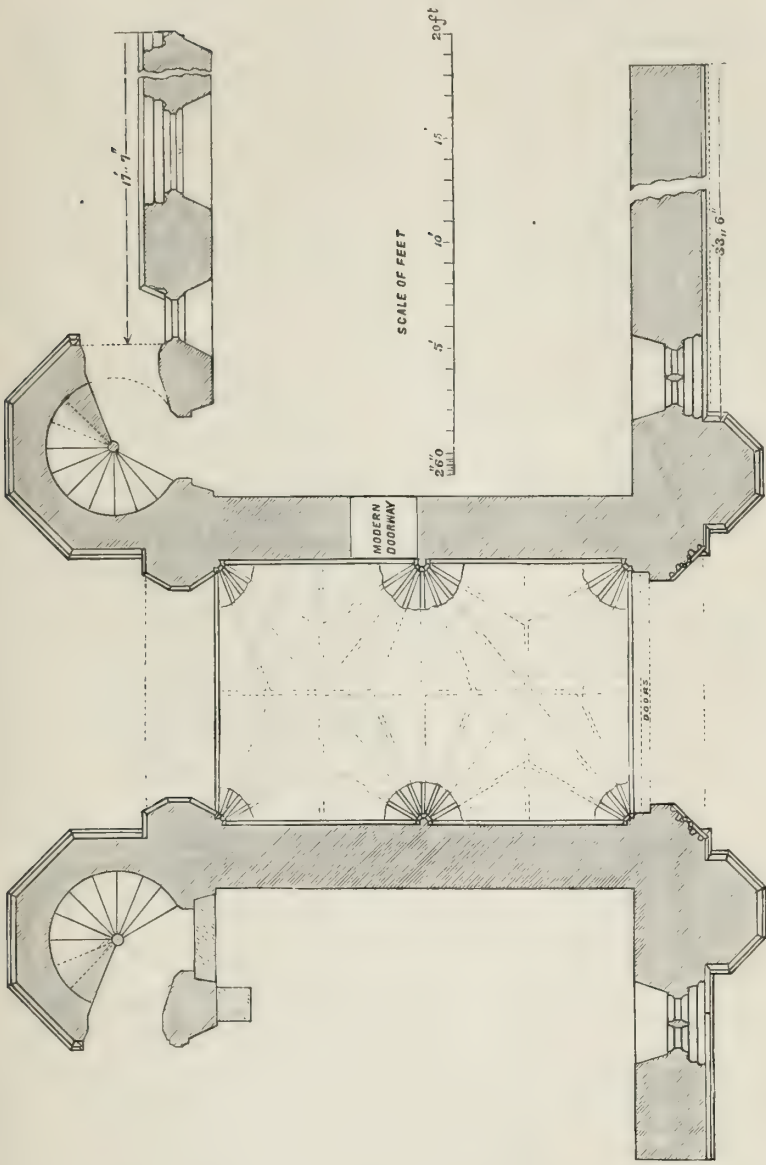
Ground Plan of the Gateway, Old Court of King's College.
